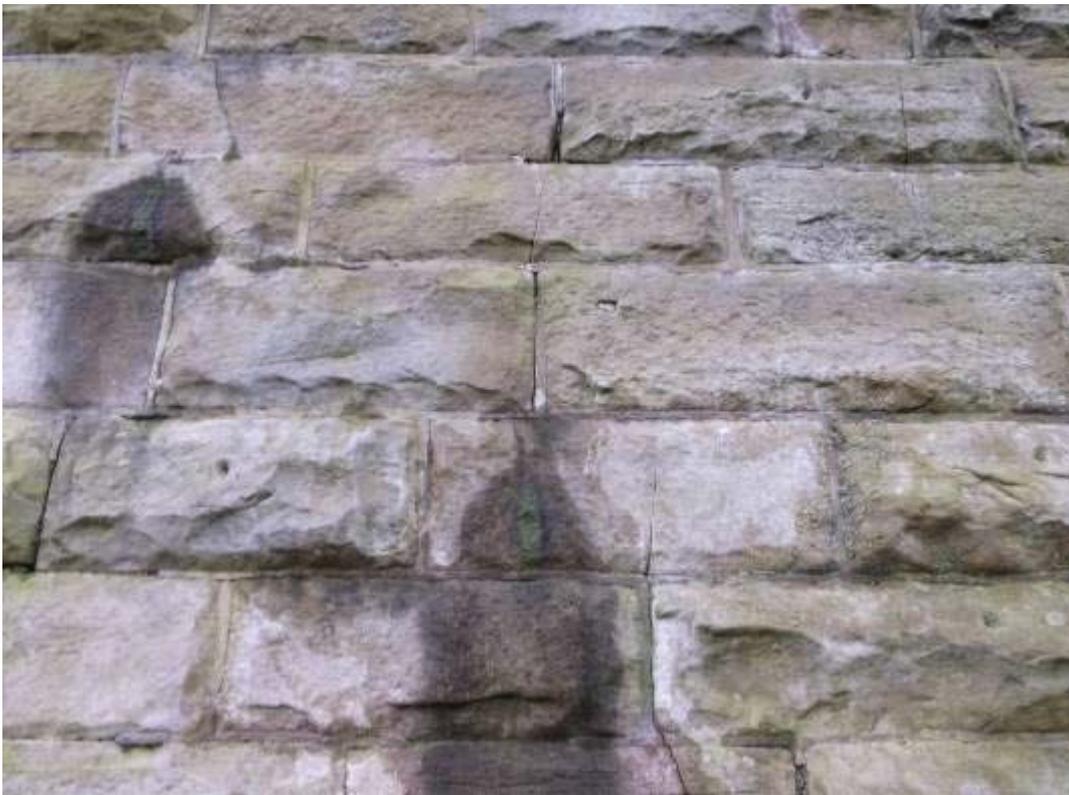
Area of loose, mortarless masonry to north west elevation of pier 9
